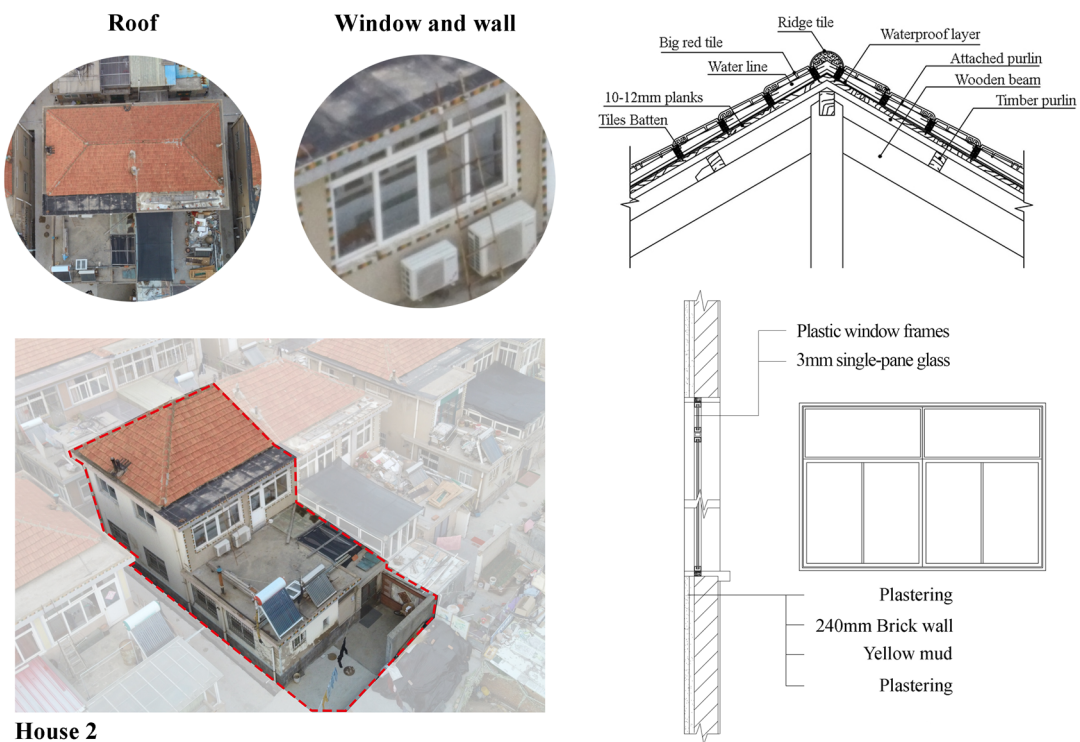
The roof, exterior wall, doors and windows of house 2
